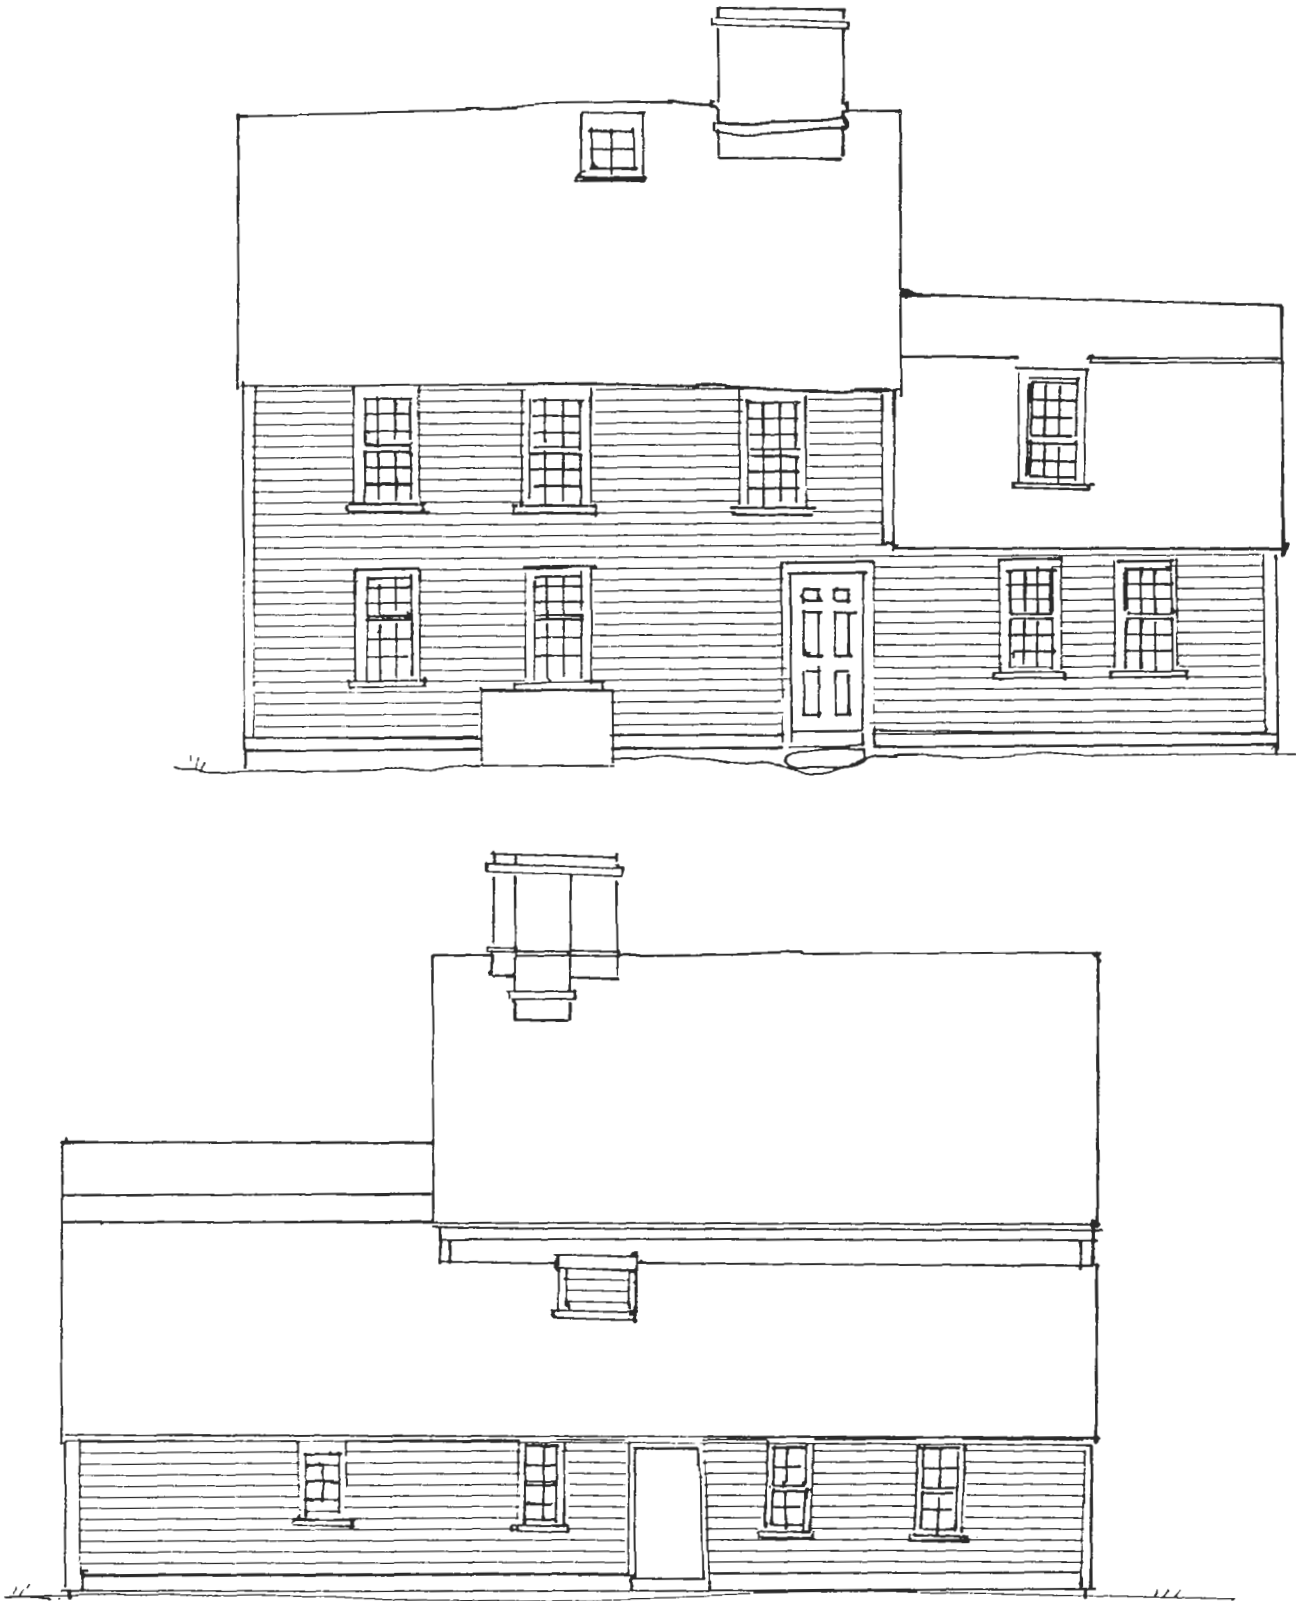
Narbonne house: existing elevations, west above, east below. Source: Narbonne house restoration construction drawings, SPNEA, 1974.
